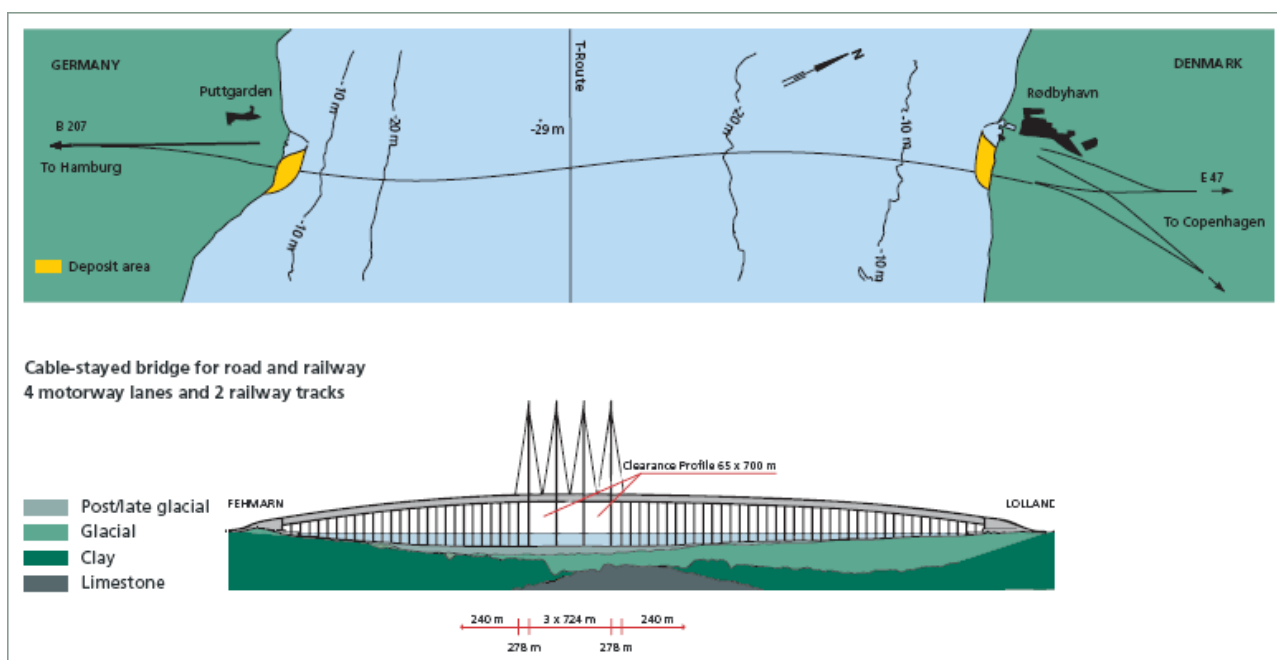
Layout and longitudinal section of the cable-stayed bridge option for 4 motorway lanes and 2 railway tracks [www2008].
